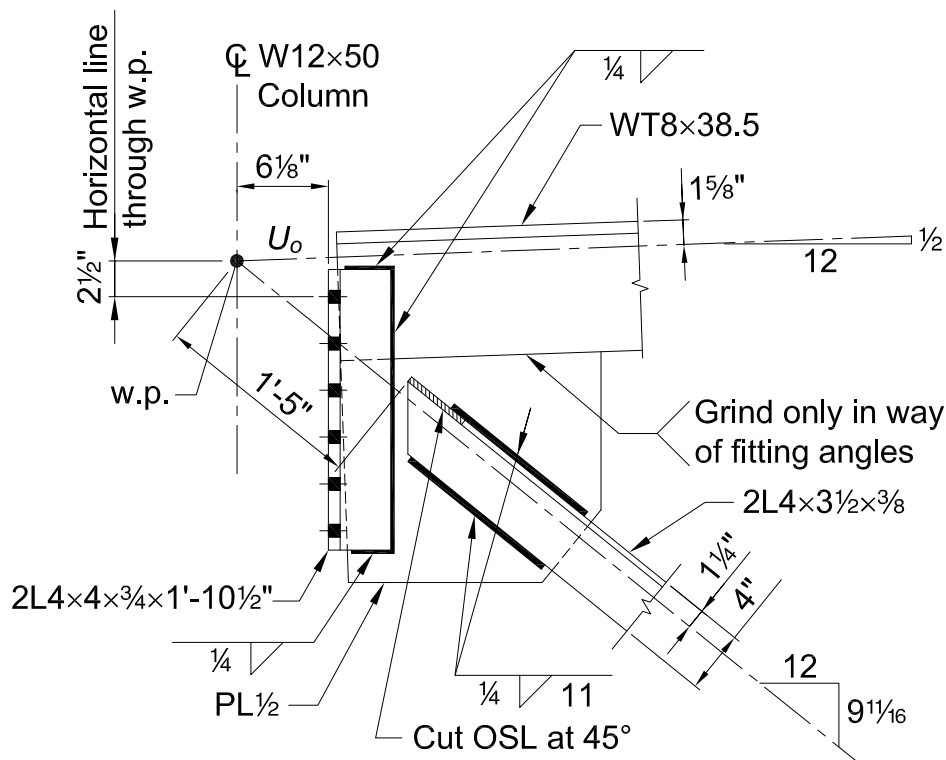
Truss-support connection, working point (w.p.) at column centerline.
